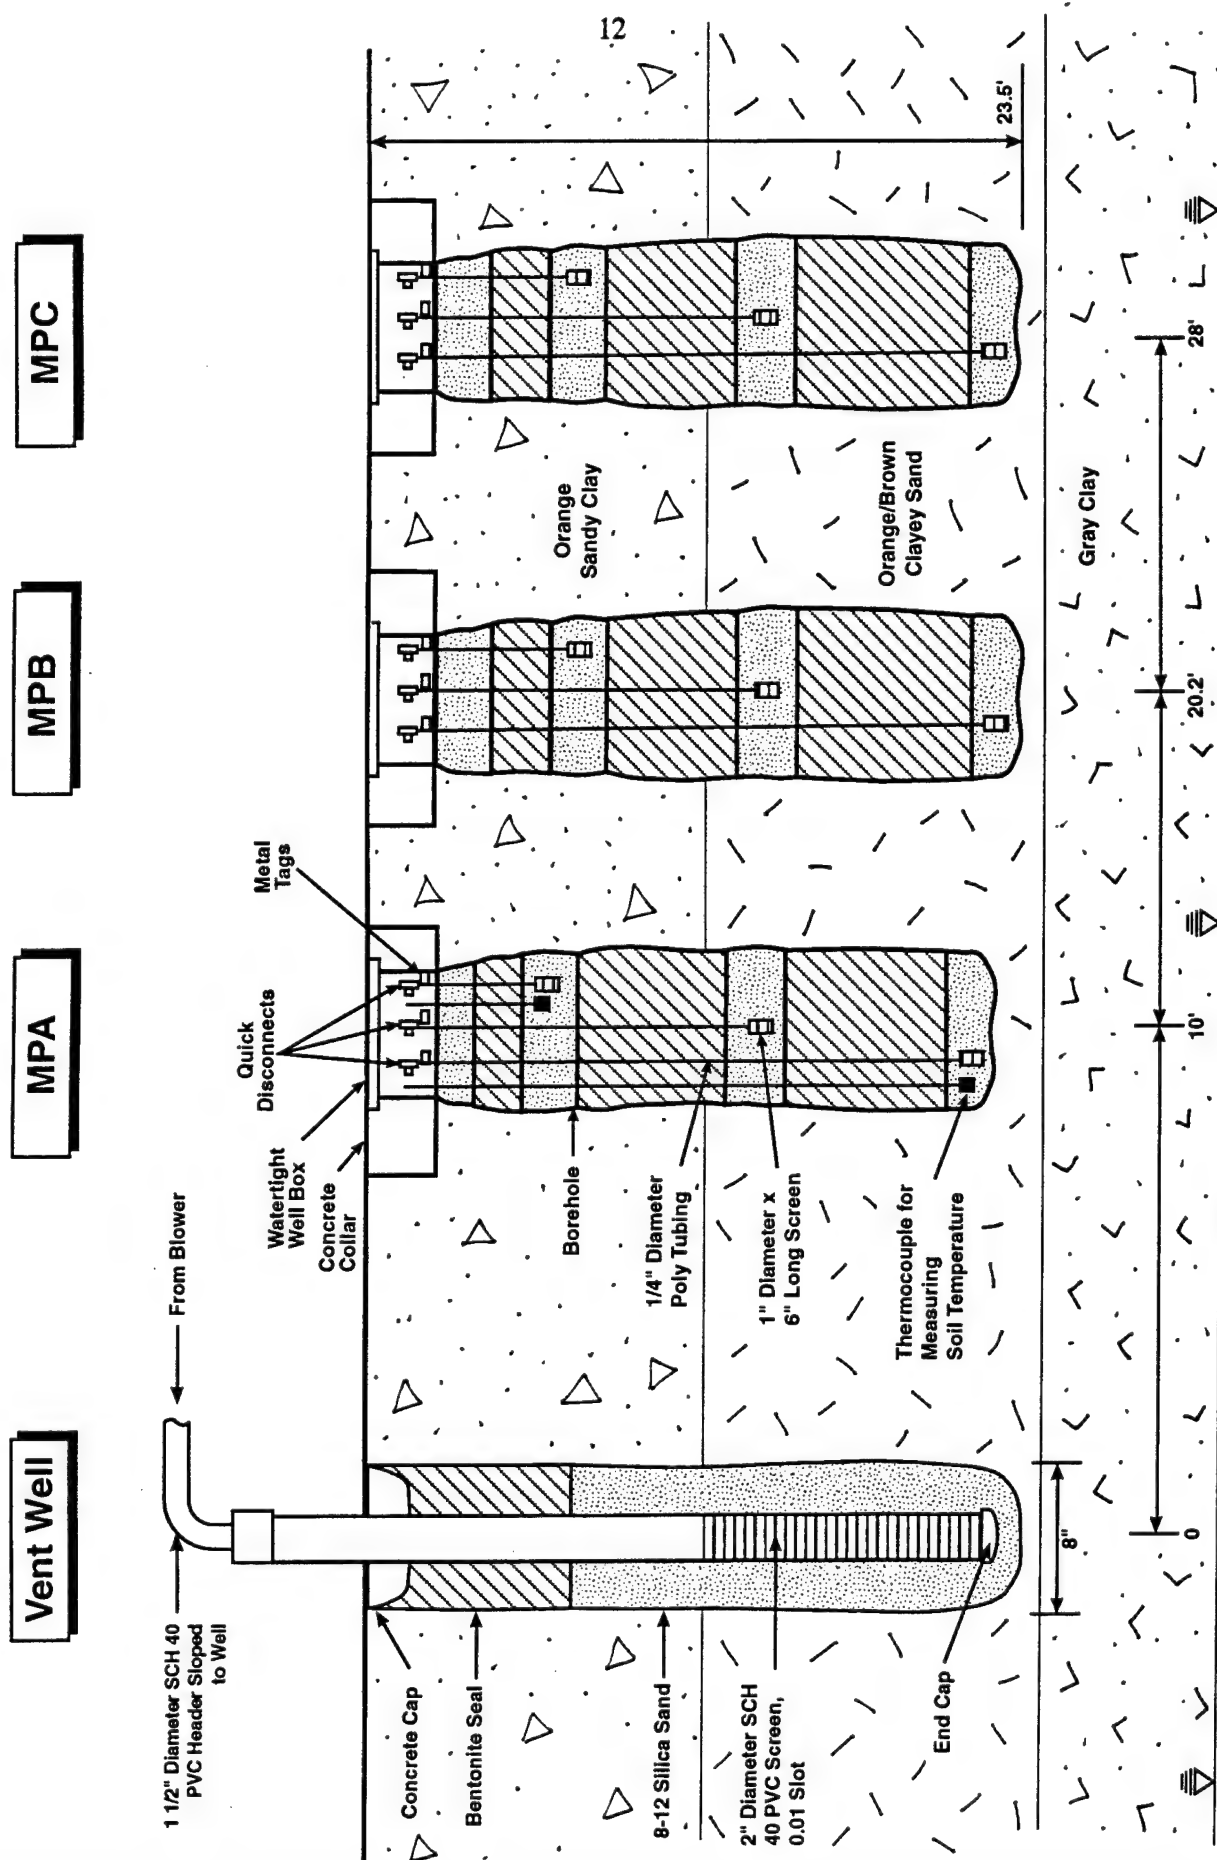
Cross Section of Vent Well and Monitoring Points at Site UST 173 Showing Site Lithology and Construction Detail (not to scale)
